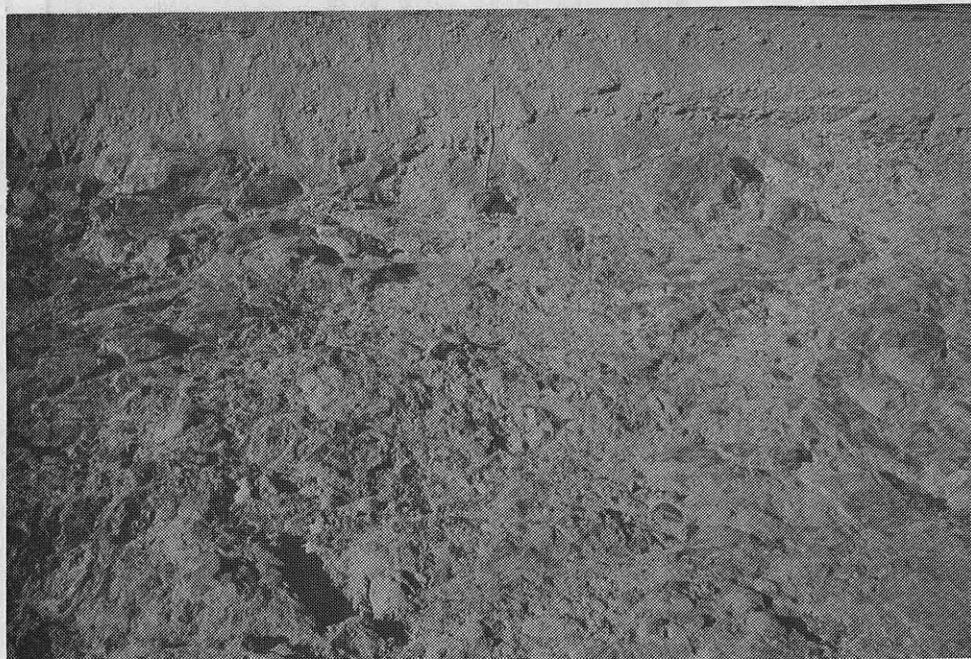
Dike no.1 exploration trench, station 81+25. Note coherent andesite blocks on both sides of photo with calichified andesite breccia toward center. January 1984
